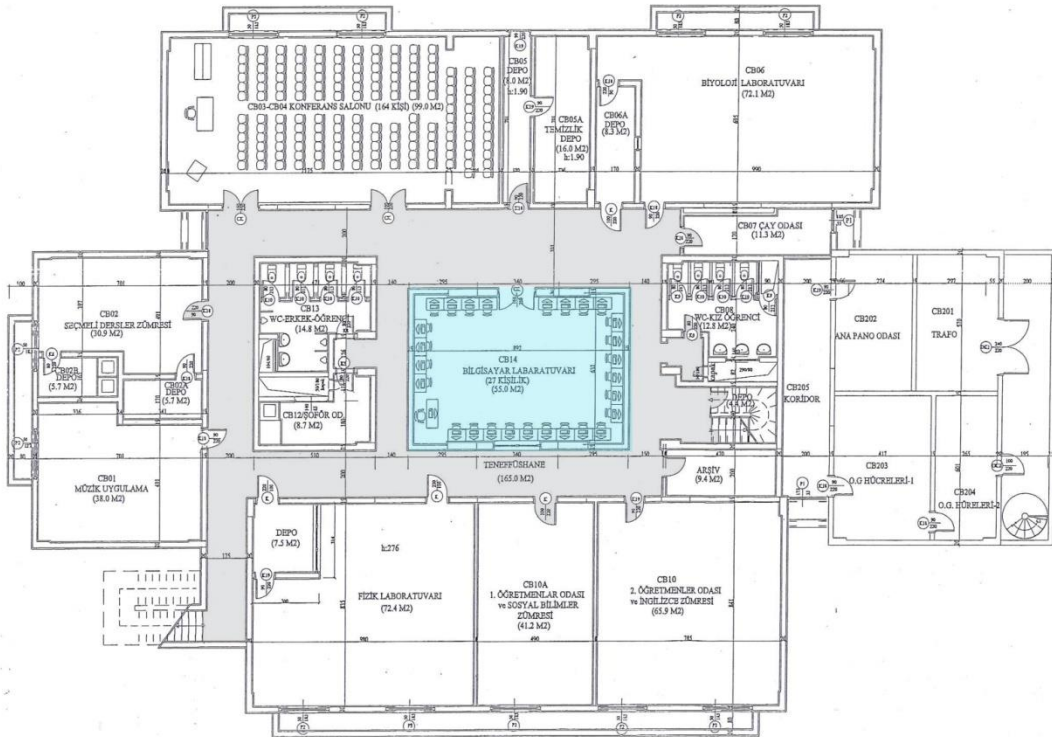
Computer laboratory location in the basement floor plan (not to scale; blue indicating classroom; gray indicating corridors)
